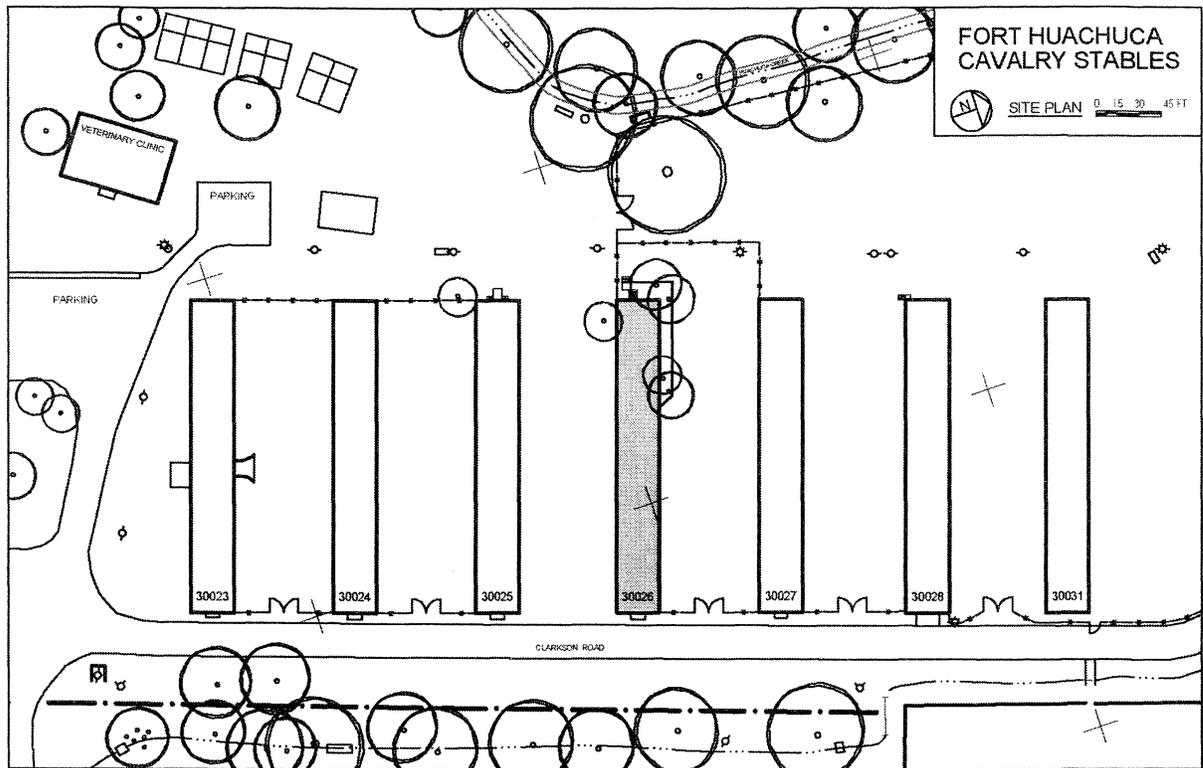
SITE PLAN SHOWING BUILDING 30026 LOCATION.
